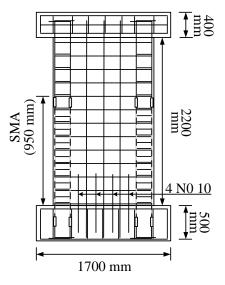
Reinforcement Layout of Wall W2-NR (modified form Abdulridha [1])
